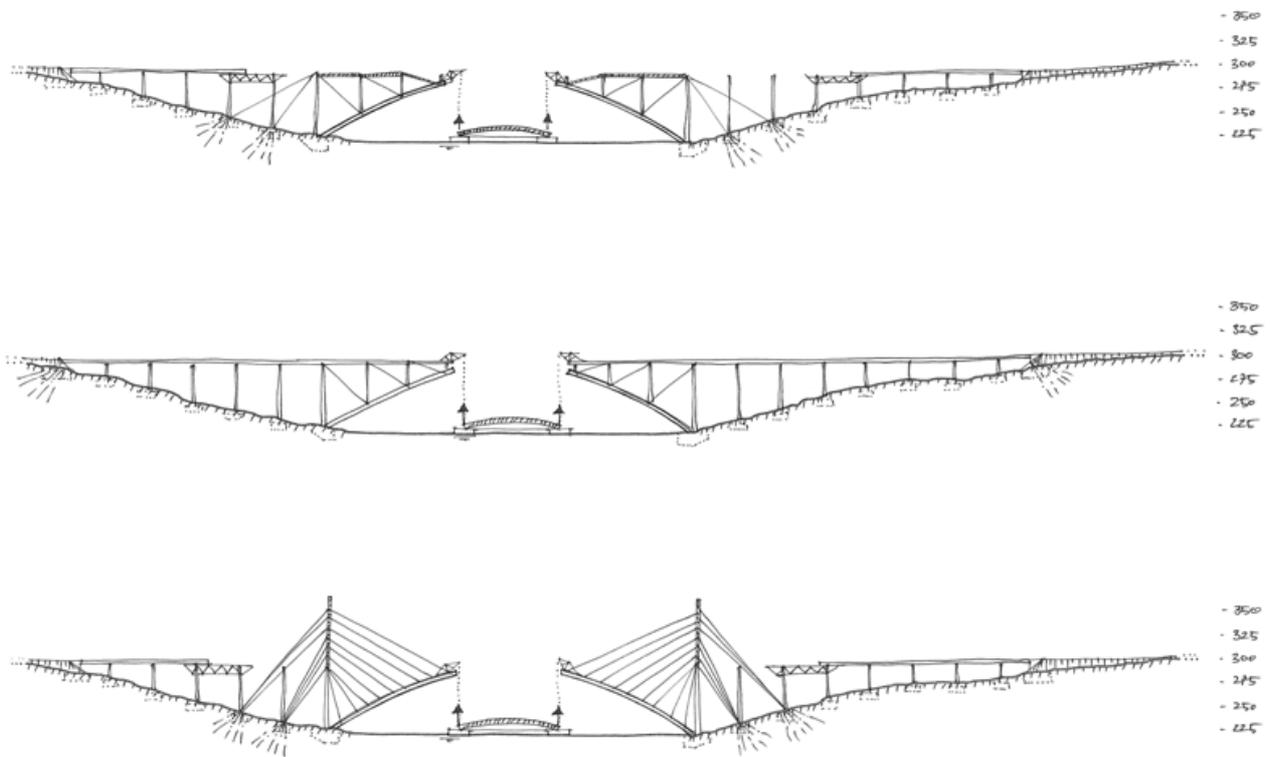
Variation of the former alternatives floating+lifting an auxiliary truss for the construction of the central part of the arch
